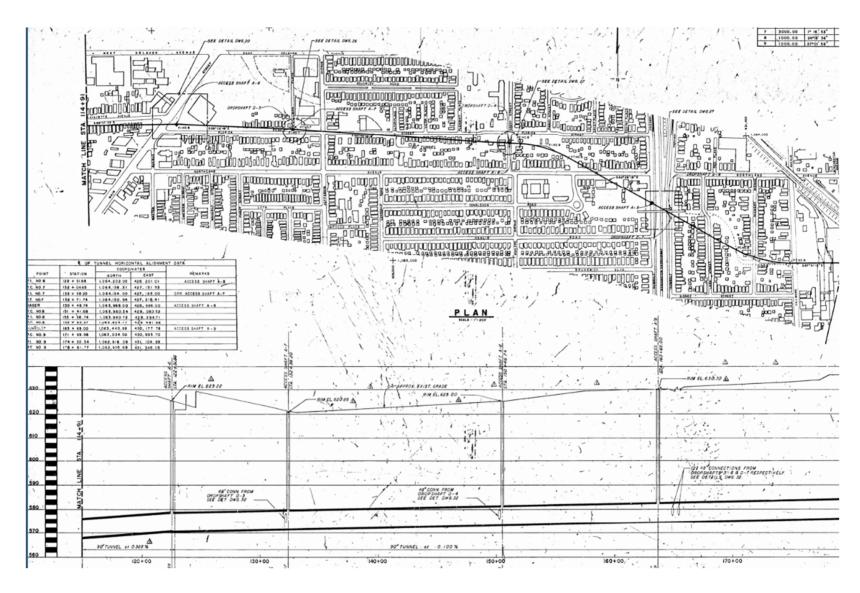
Existing Scajaguada Tunnel Interceptor Plan and Profile
